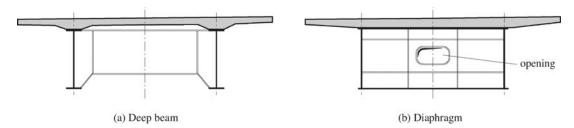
Cross bracing using deep beams or diaphragms.
